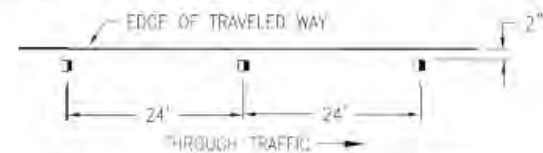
LANE LINE EXTENSIONS THROUGH INTERSECTIONS
